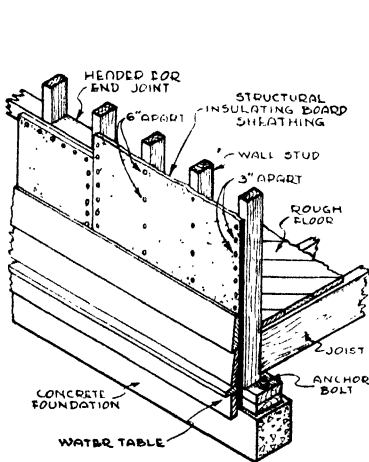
Structural Insulating Board Used as Sheathing under Wood Siding
